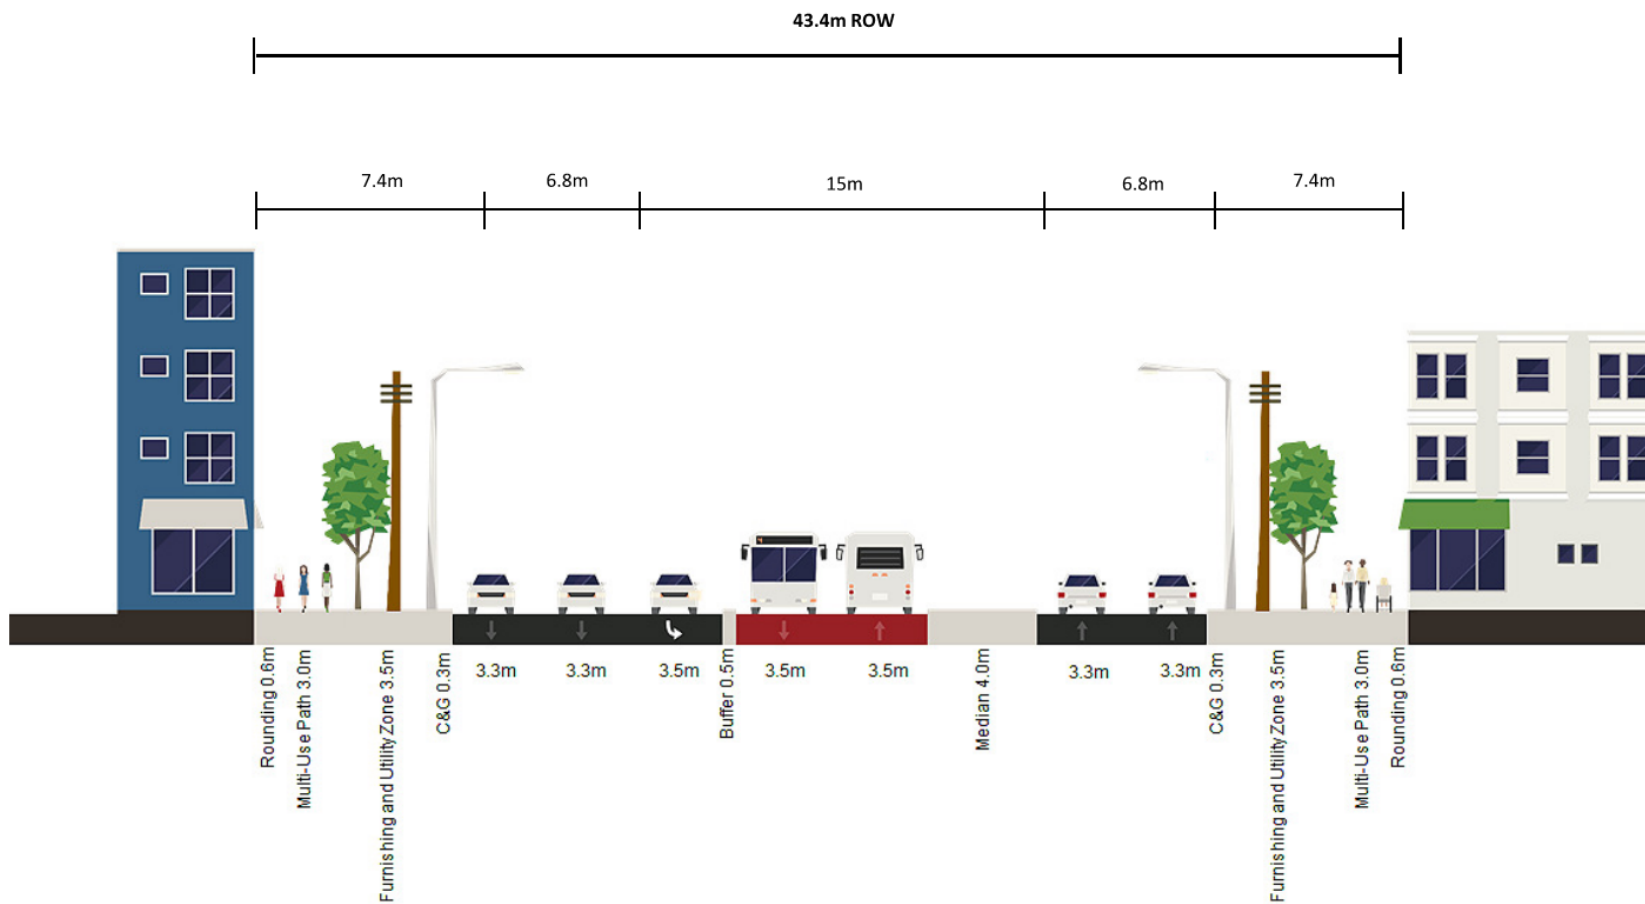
ULTIMATE VISION Intersection / Station Typical Section – Rapidway with 4 GPL with AT facilities
